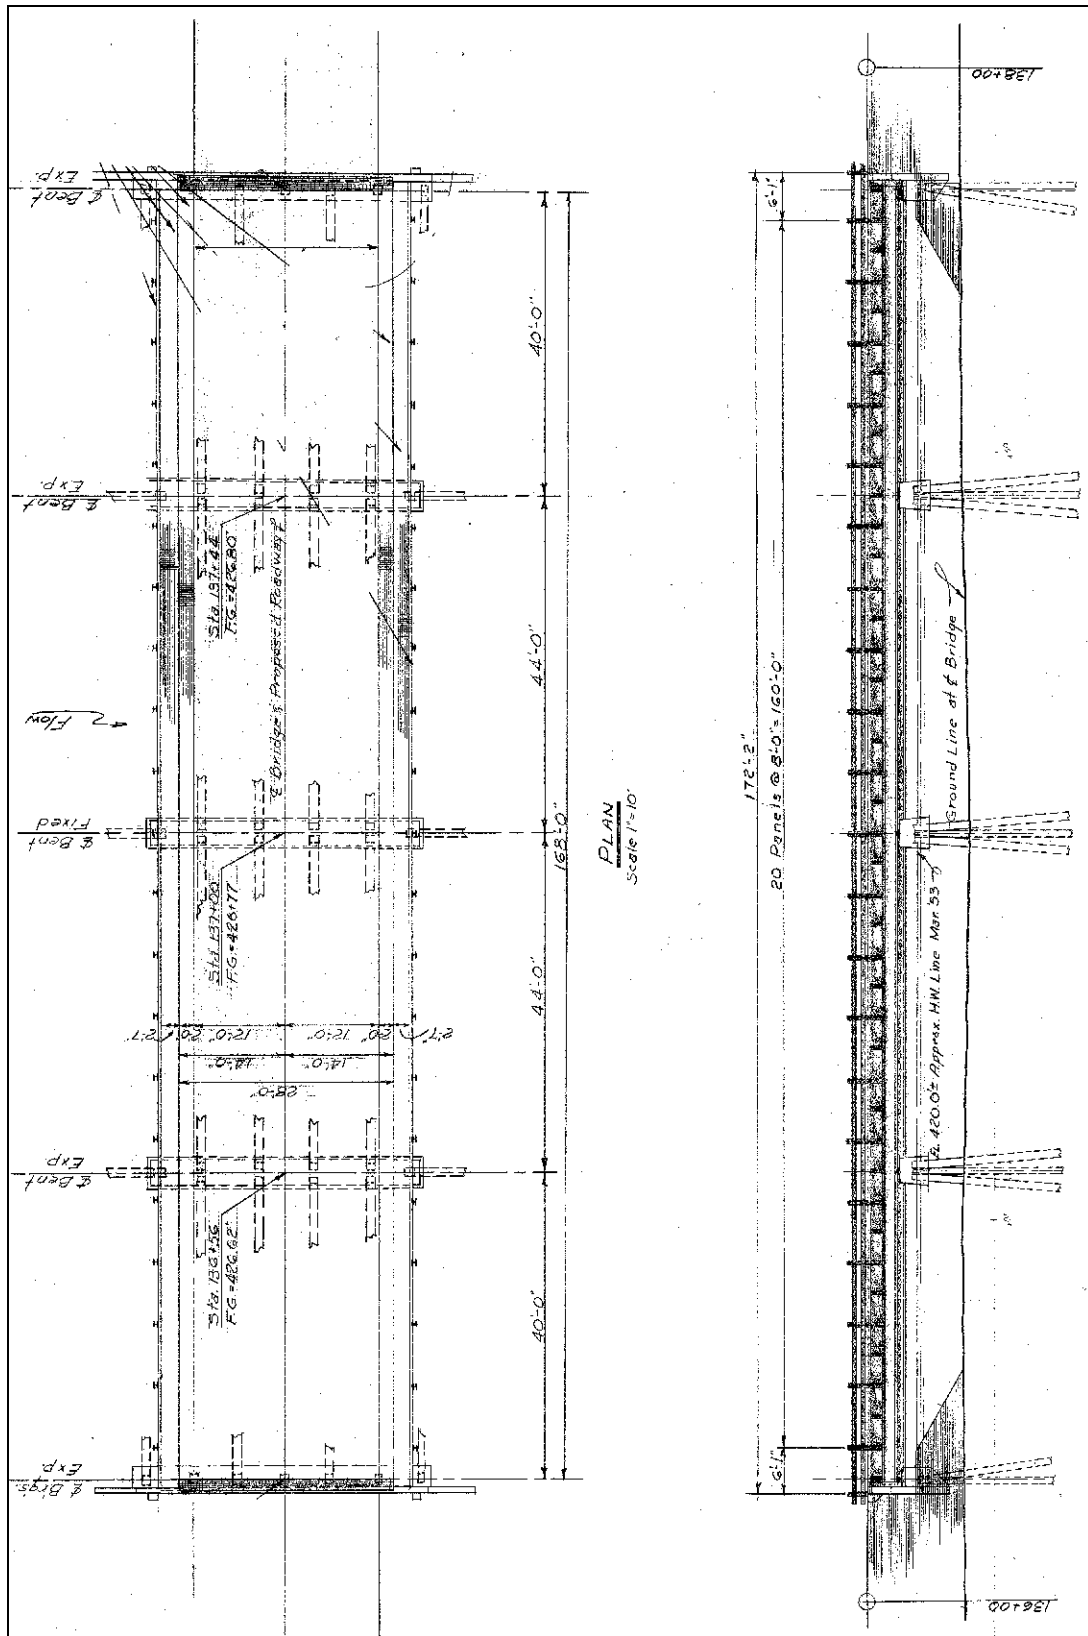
Plan and elevation of bridge from original drawings (NHDOT File No. 3-4-3-5).
